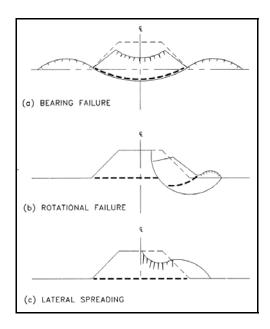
Embankment Failure Modes on Weak Foundation Soils (Haliburton et al., 1978).
